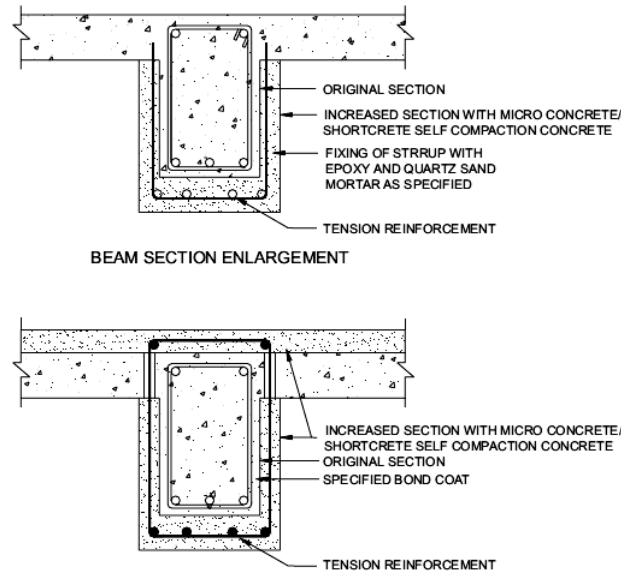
Beam Strengthening by concrete overlay and section enlargement
